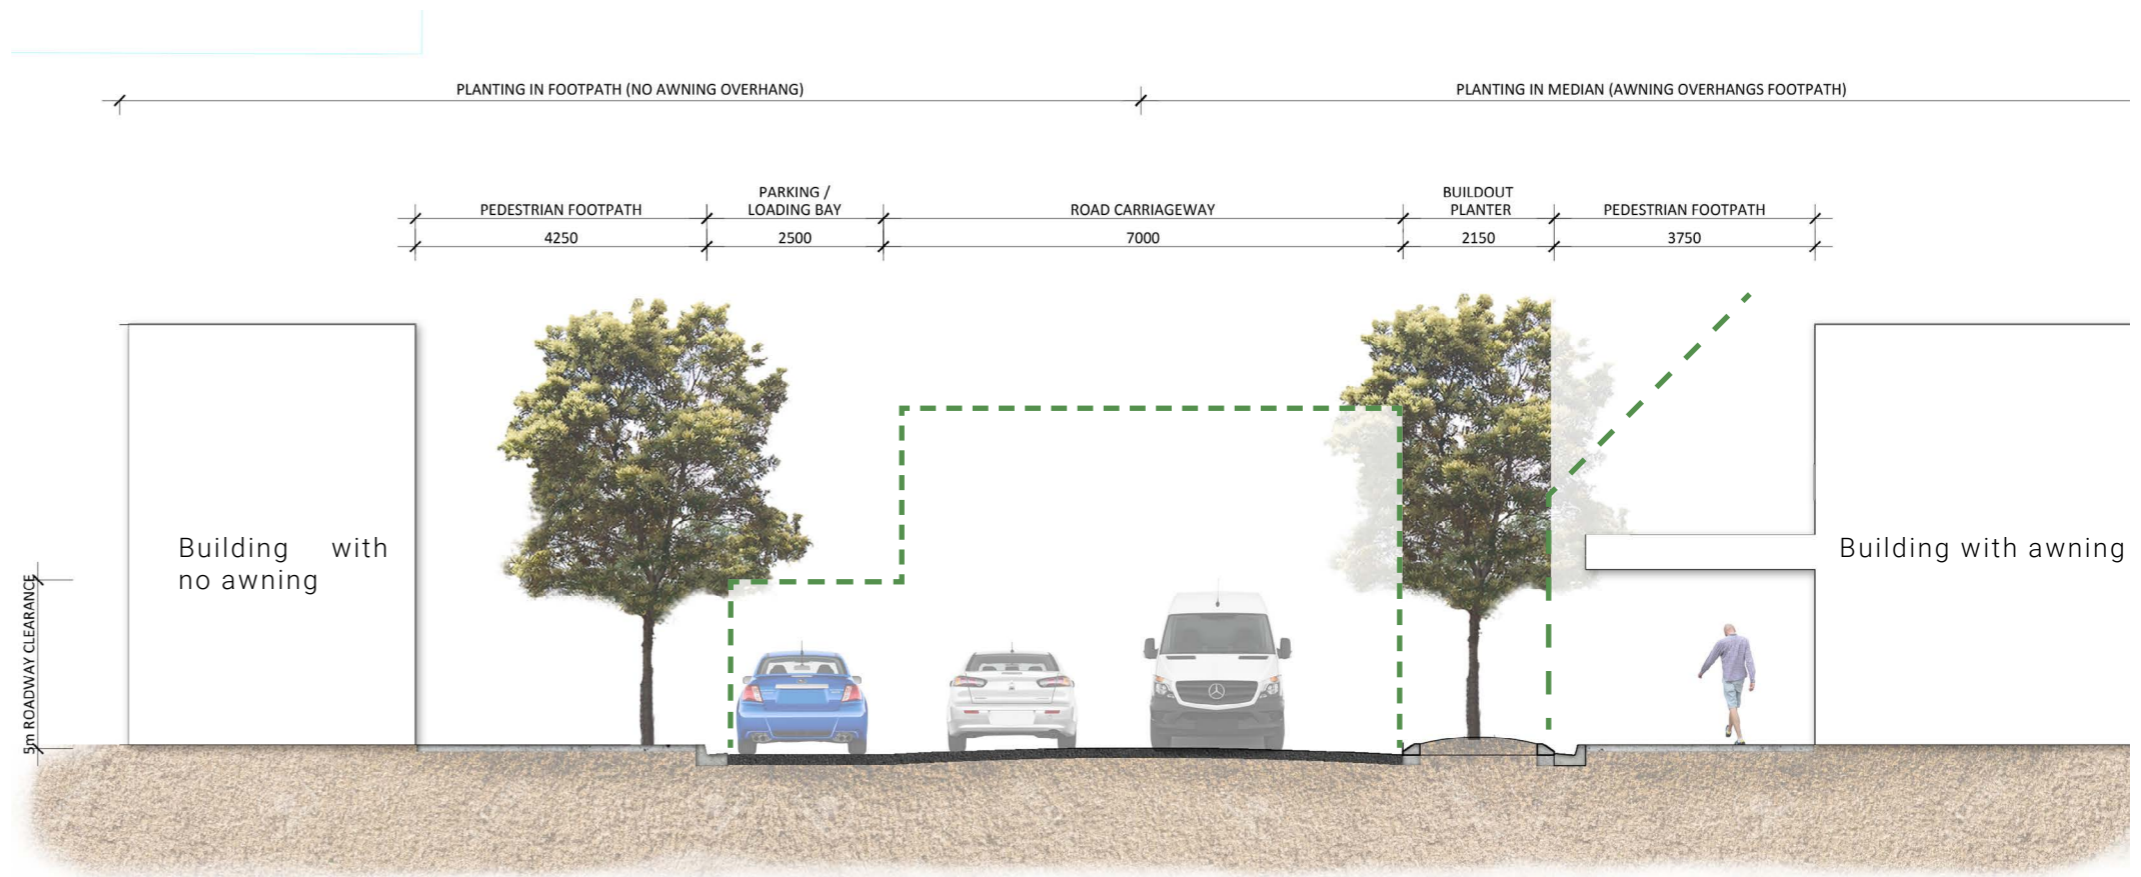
CBD Streetscape section showing pruning setbacks for street trees. This section is based on a standard two-way street with parallel parking.
